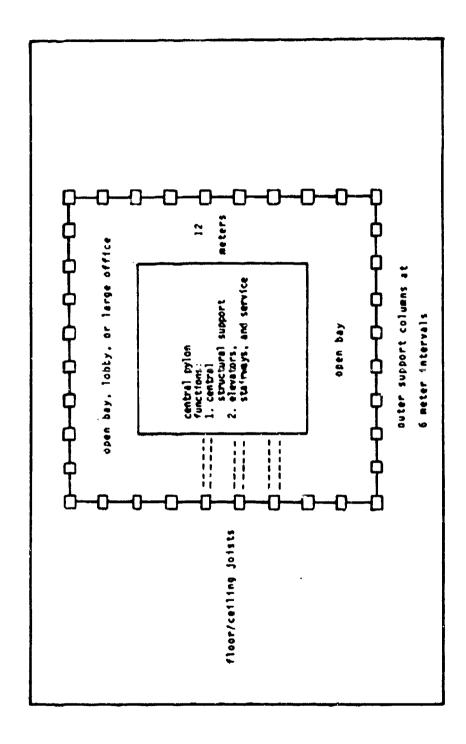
Steel/Concrete-Framed Tall (30+ Storkes) Building with Central Pylon and Light Cladding Typical Ground-Ploor Plan
